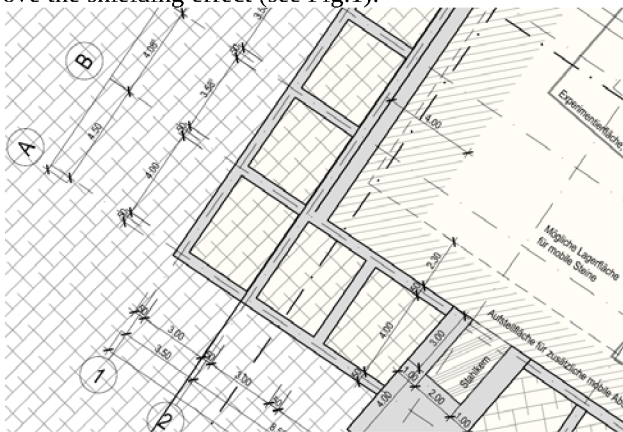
2011 layout of south-east part of the building G50 with enclosed soil packs on the outside wall.
